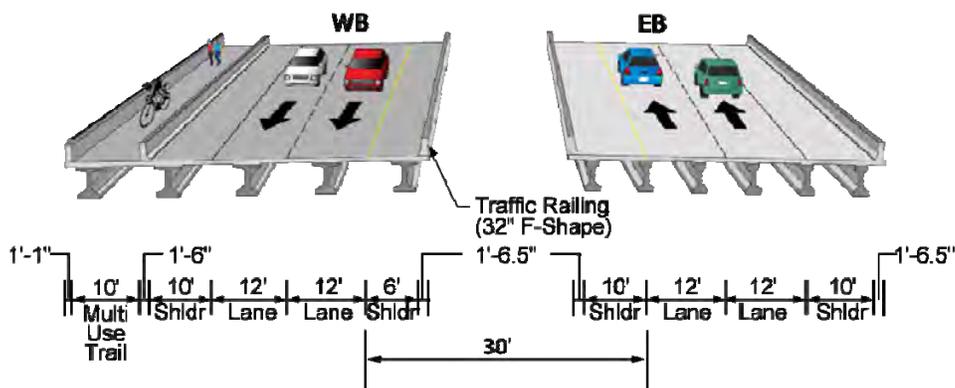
Bridge Typical Section with Shared Use Path
